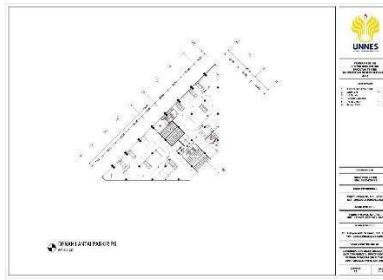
2<sup>nd</sup> Floor Plan
